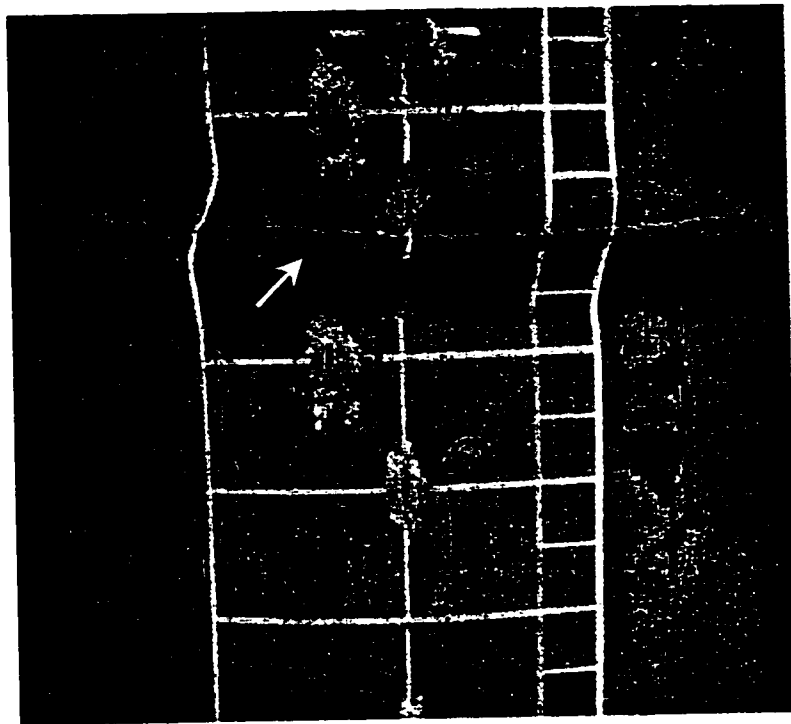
Wrinkle of Pipe L178P00BW-7
